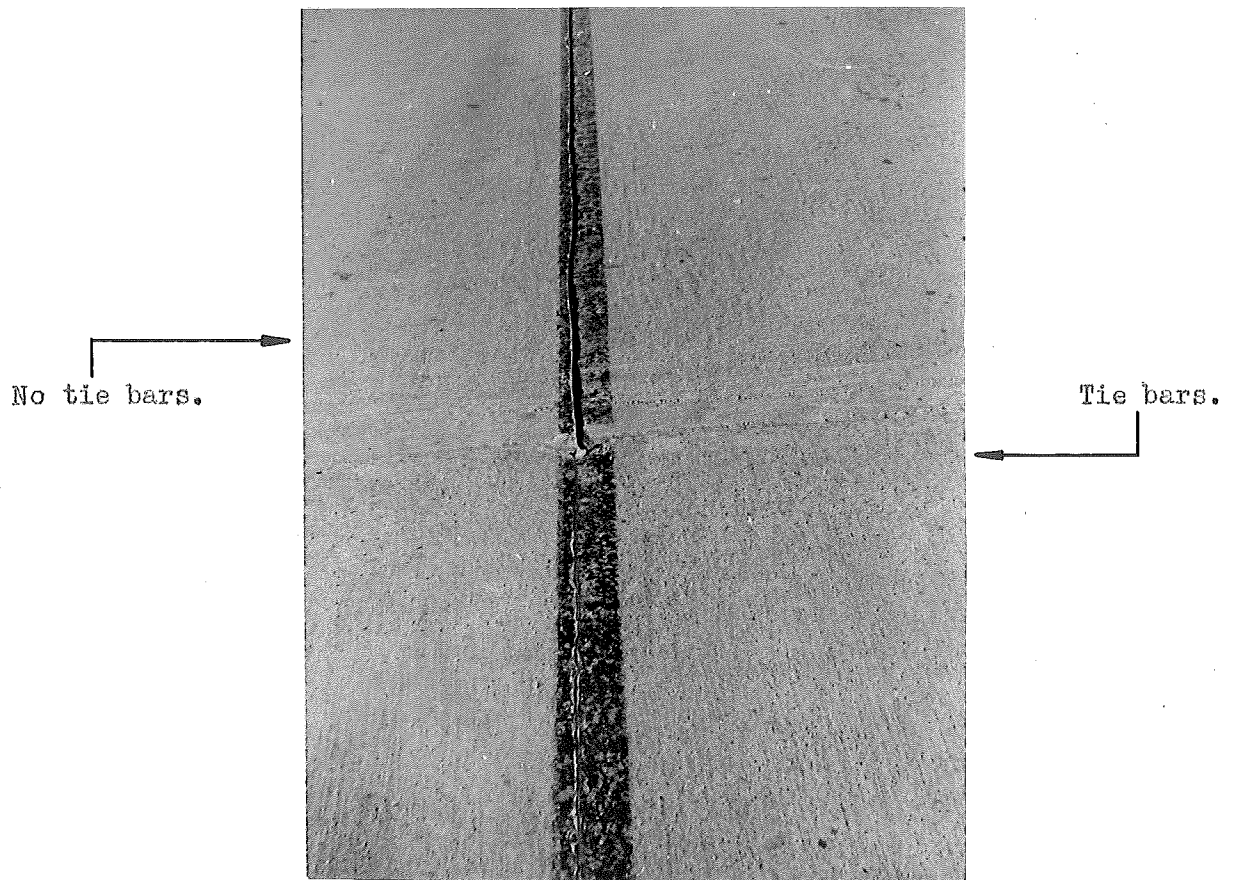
Showing condition of longitudinal joint with and without tie bars, Station 396+00.
